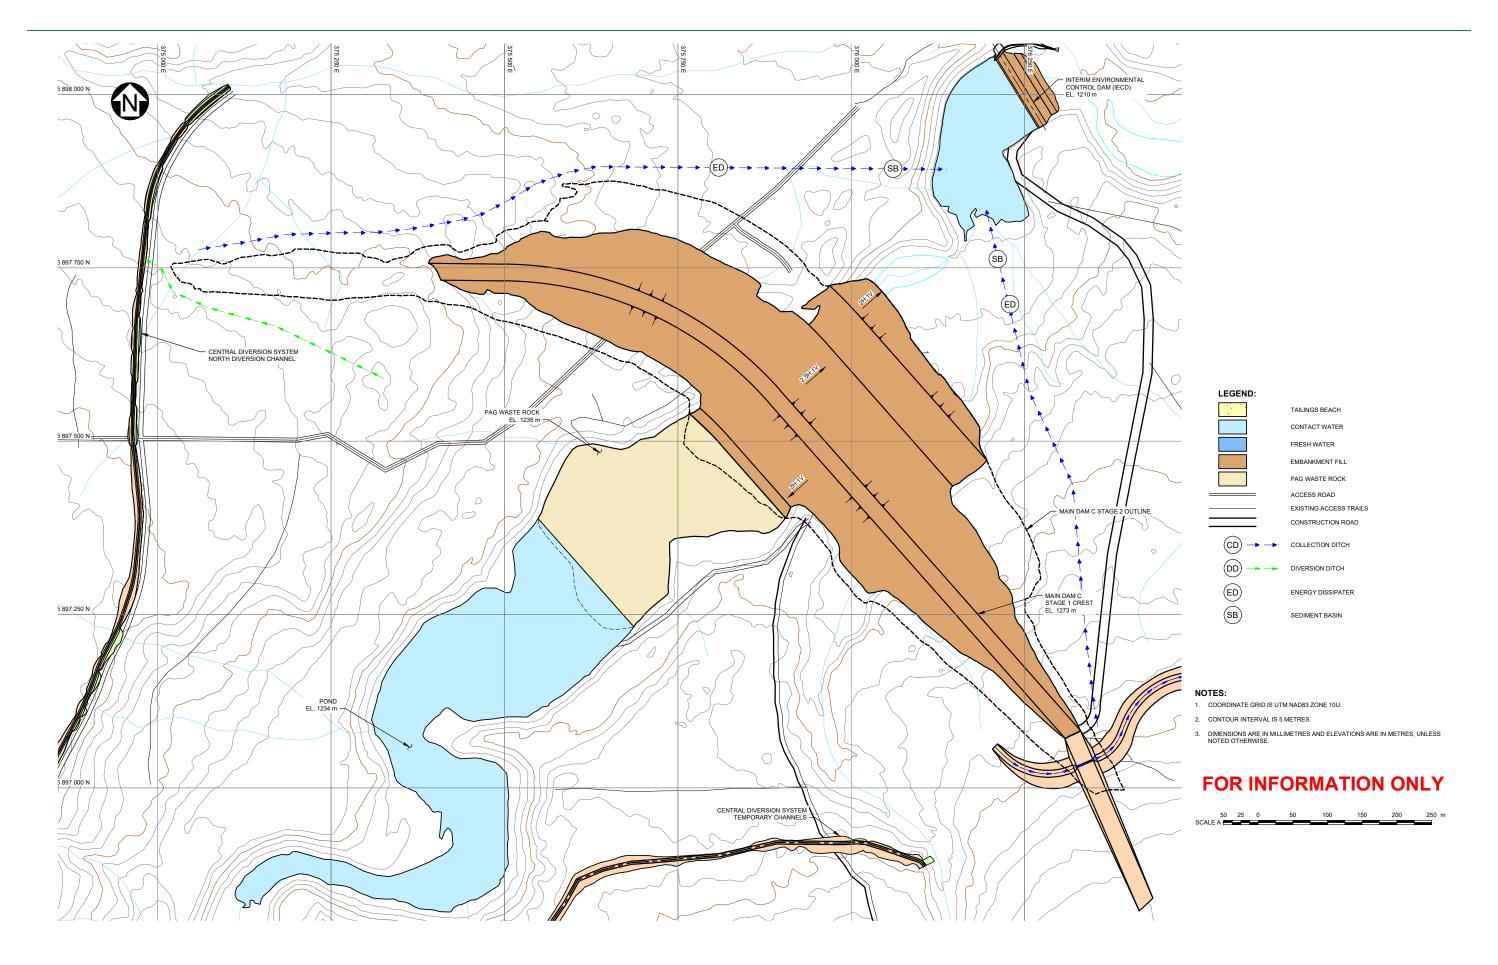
Main Dam C Stage 2 Construction (Year +1) – Erosion and Sediment Control Plan
